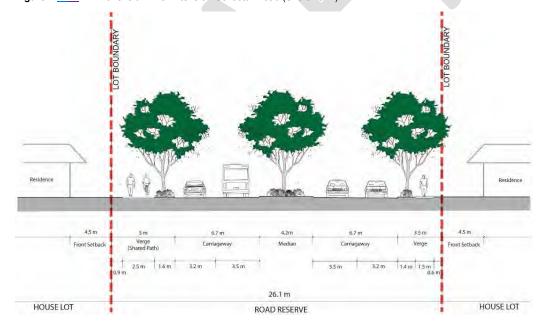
Dransfield Drive Extension Collector Road (Long Term)
